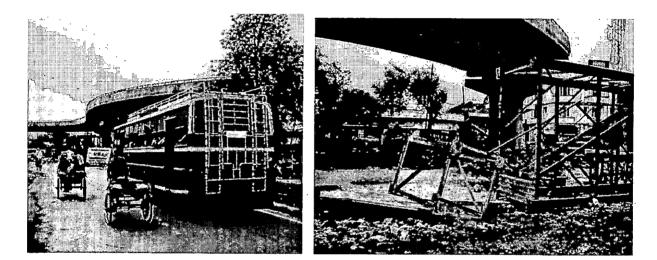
Elevated Road Project at Outer Circular Road (Source: By Author)
